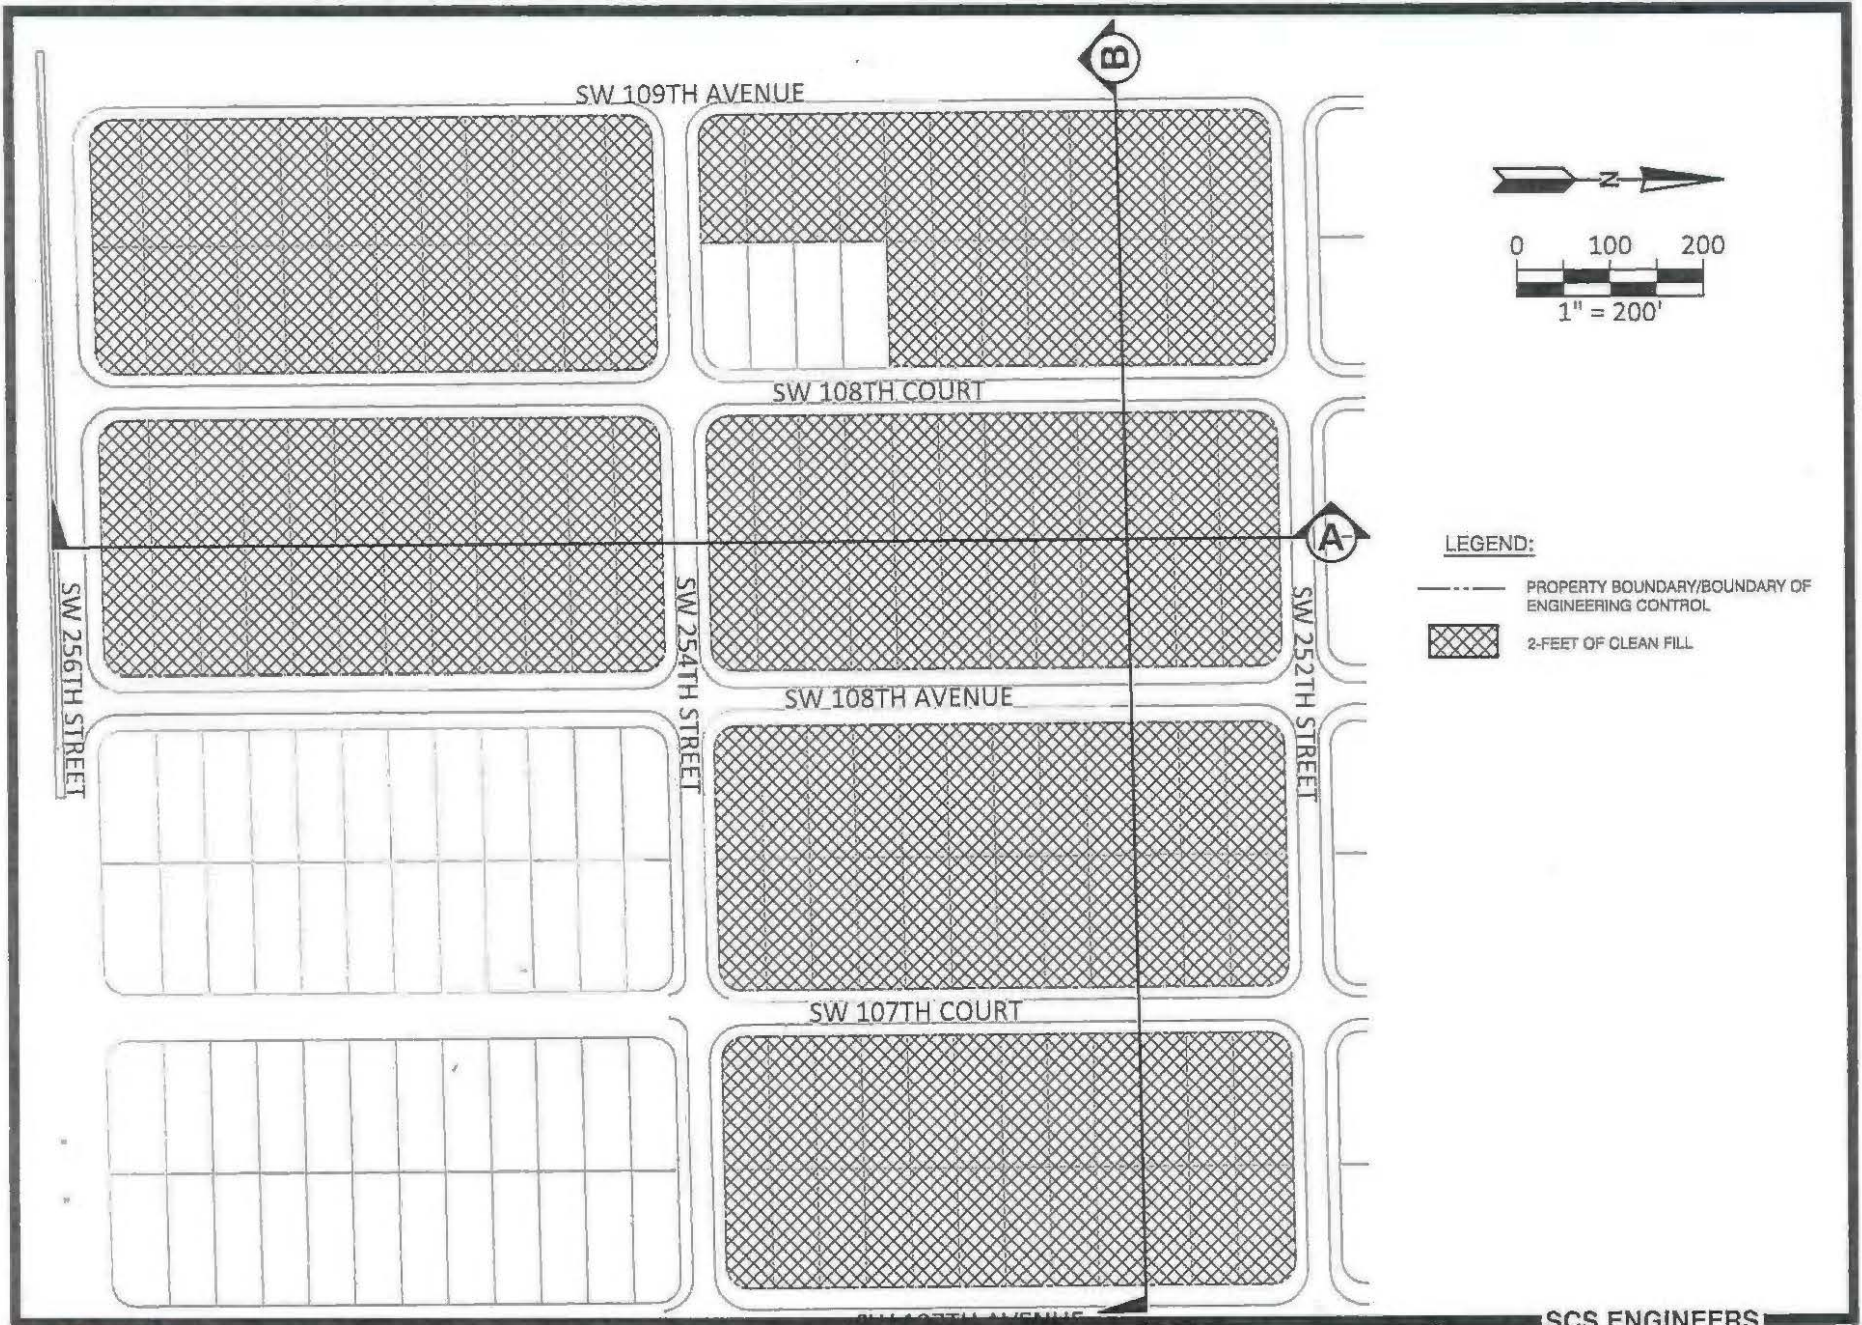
EXHIBIT C, FIGURE 1. ENGINEERING CONTROL PLAN
